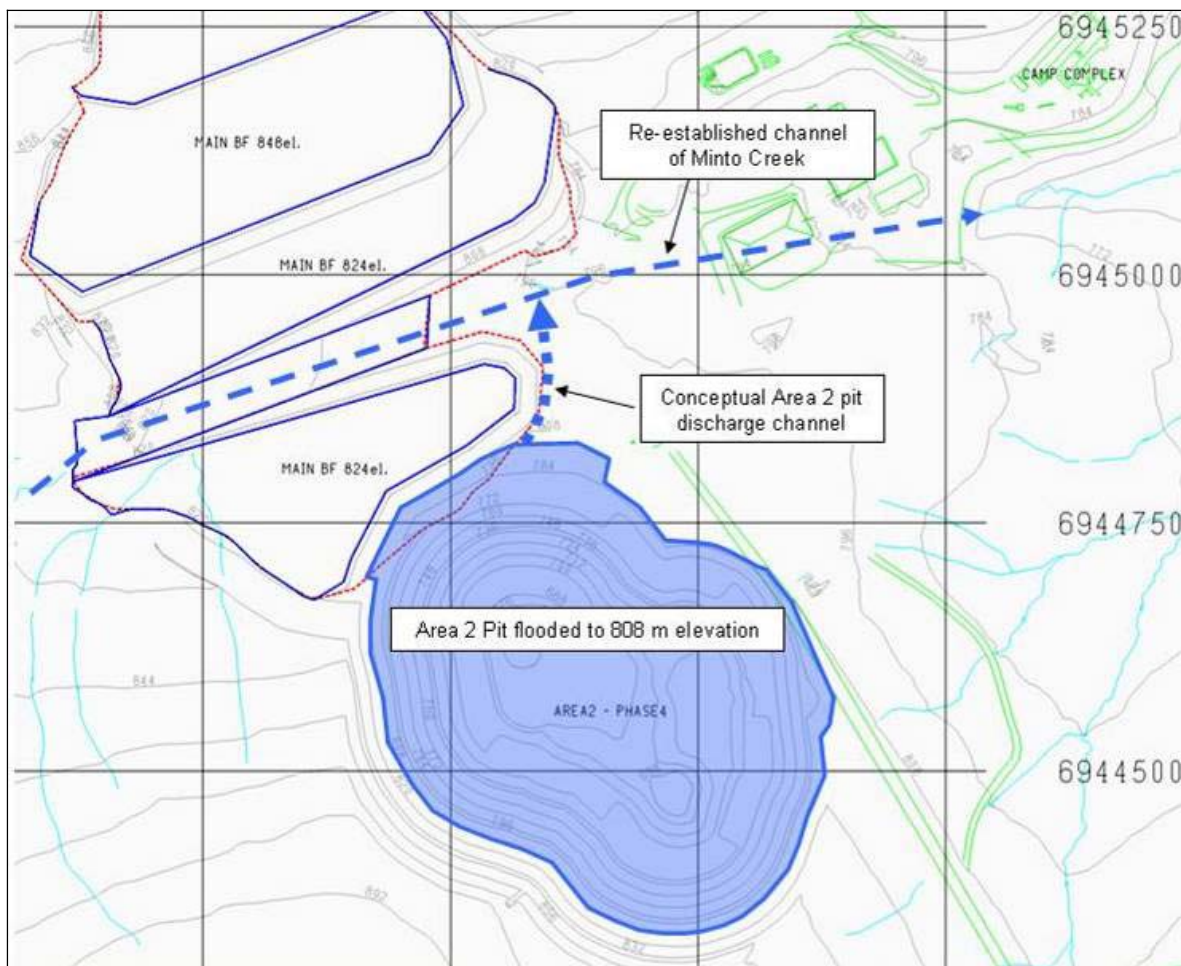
Schematic Plan Showing the Flooded Area 2, Routing of a Pit Discharge Channel and Routing of the Re-established Minto Creek
